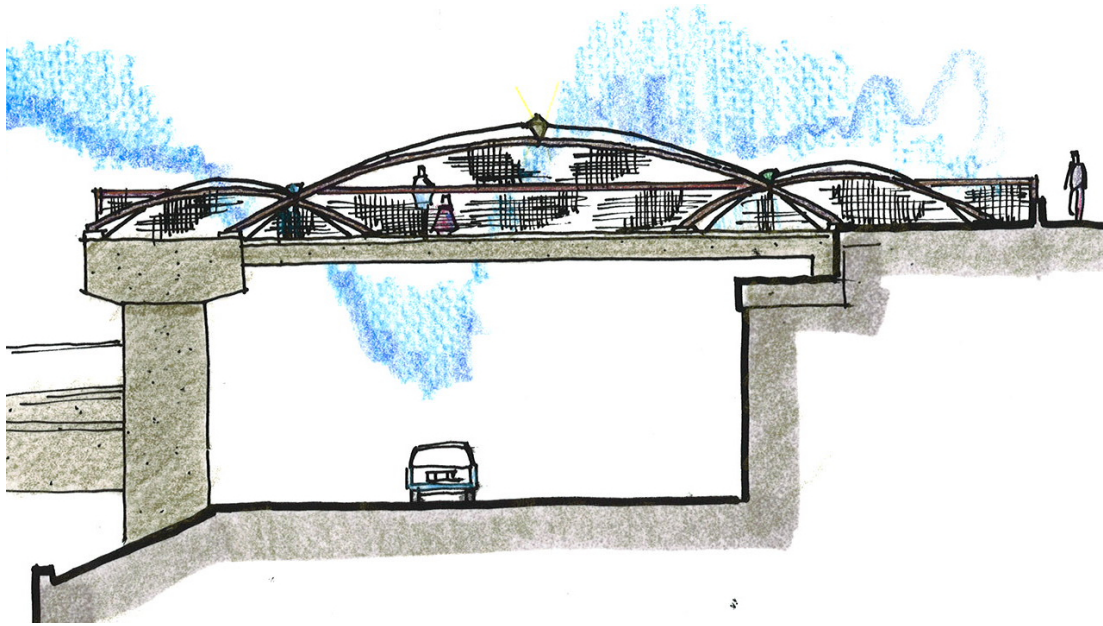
Prestressed girder bridge with faux truss railing was more cost effective than steel truss.
